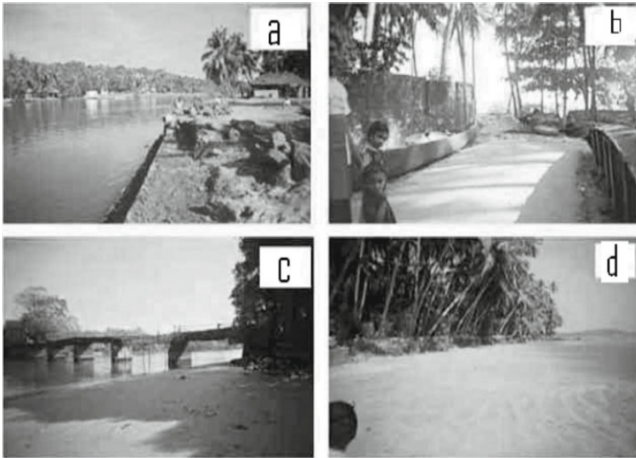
Examples of tsunami inundation from northern Kerala: (a) Collapsed embankment at Choottad, Cannannore; (b) Country boats thrown inland at Kadalur point, Calicut; (c) Damaged railway footbridge at Thalassery; and (d) Collapsed laterite banks at Kadalur point, Calicut (Kurian et al., 2006).
